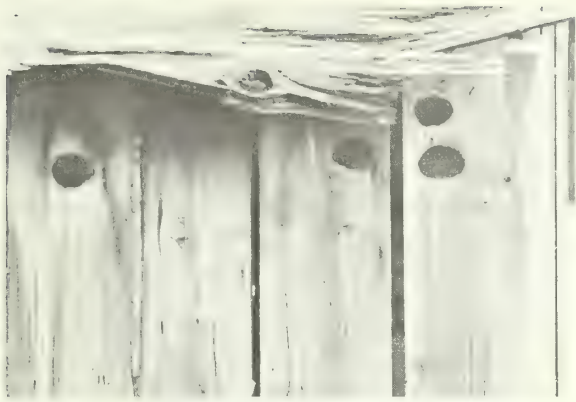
Common flickers (*Colaptes auratus*) often peck holes through the outer wall of “double-walled” buildings and nest in the interspaces. In this case, the holes are in the wall under the overhang of the roof. These “cavities” are secondarily inhabited by other species of wildlife. (Chris Maser photograph)
